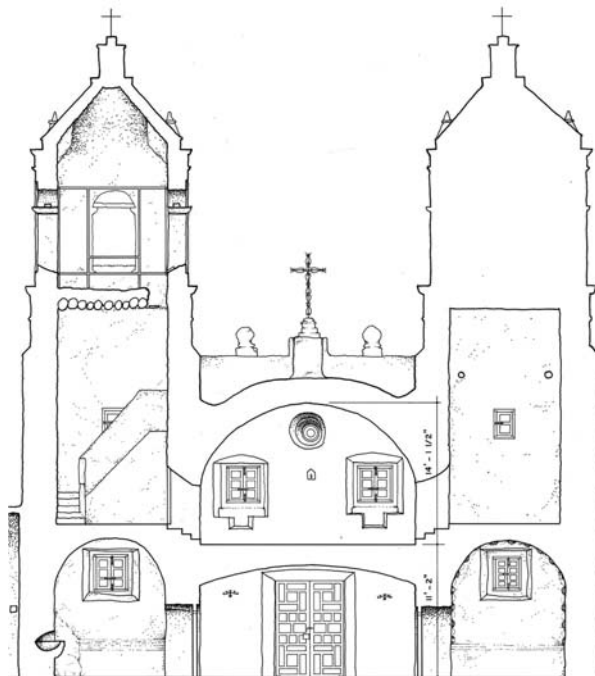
Western Elevation cross-section of 'Mission Concepcion church' (Photo courtesy: <https://www.loc.gov/pictures/collection/hh/item/tx0038/>)
